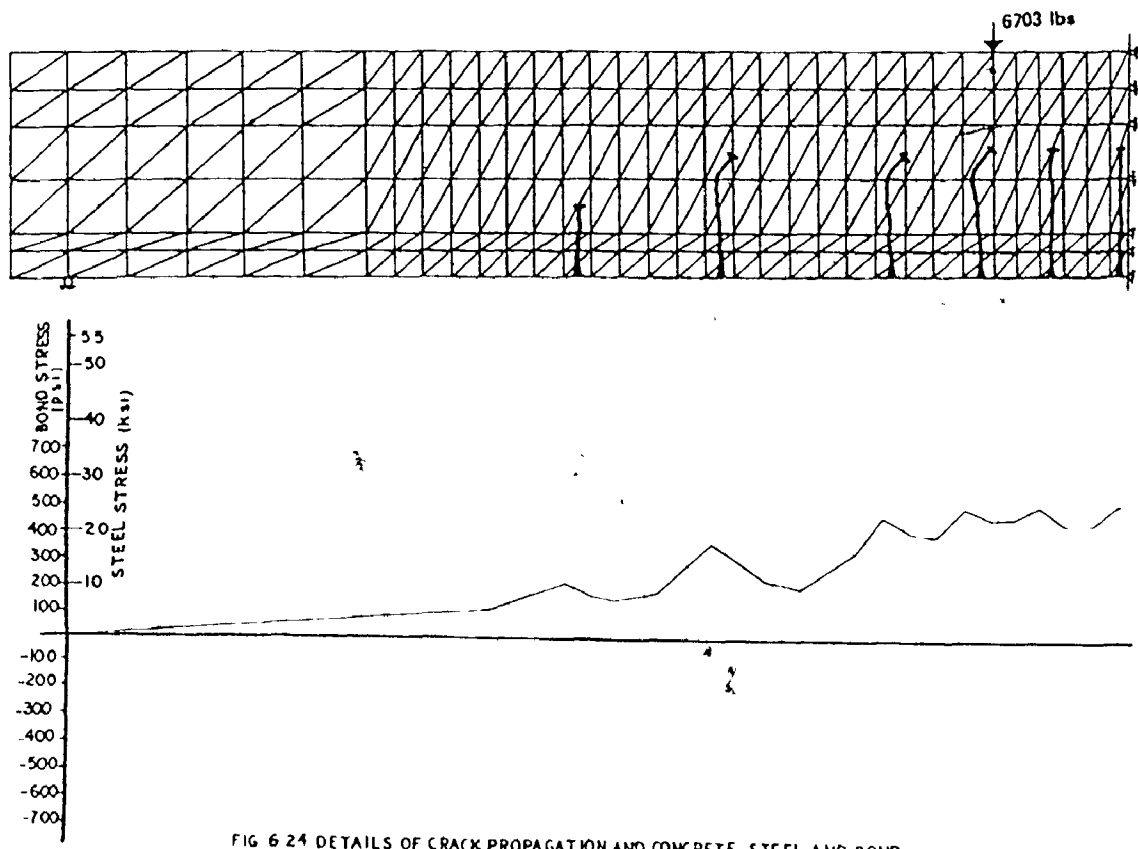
DETAILS OF CRACK PROPAGATION AND CONCRETE, STEEL AND BOND STRESS DISTRIBUTIONS FOR BEAM(7/1)
